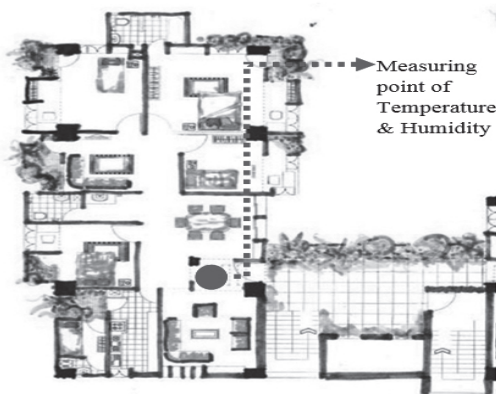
Extensive Green Roof of studied house Case study 02 (Single residence), floor plan
